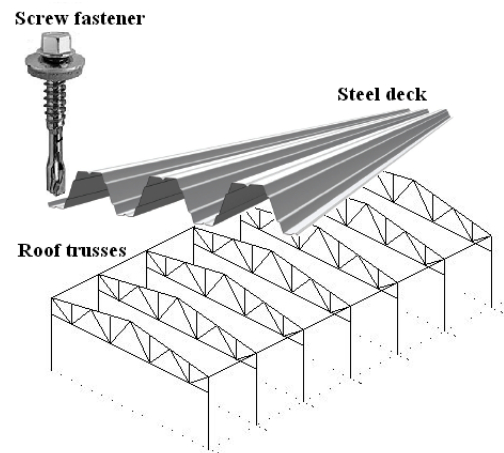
Application of self-drill screw connector for connecting roof deck to roof trusses.
